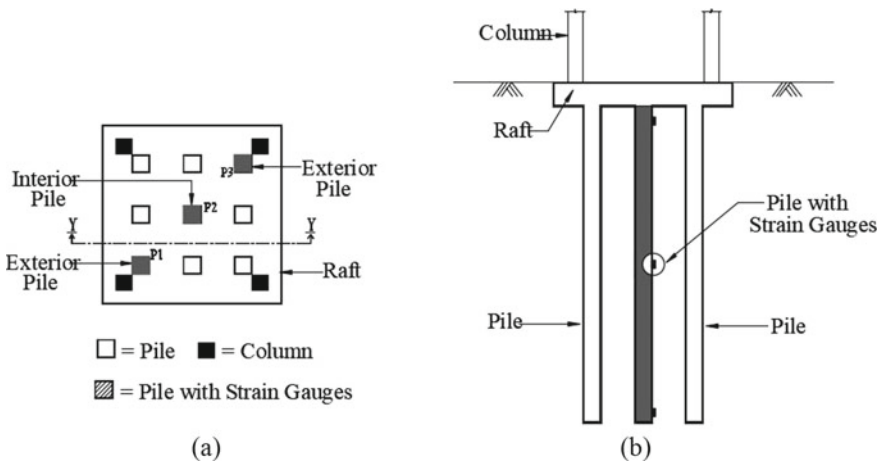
Schematic representation of model piled raft: a Plan; b Sectional elevation
